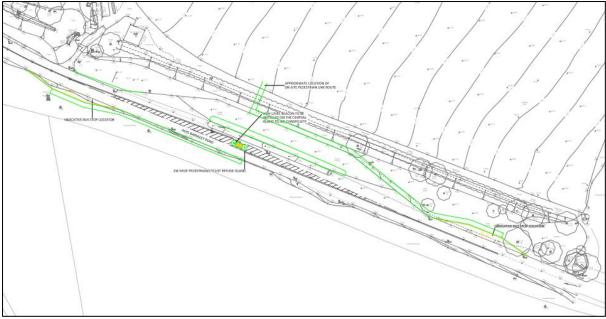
Showing bus stops either side of Barnsley Road near the layby (to be retained) with footpaths, refuge island and pedestrian link into the MSA site.
